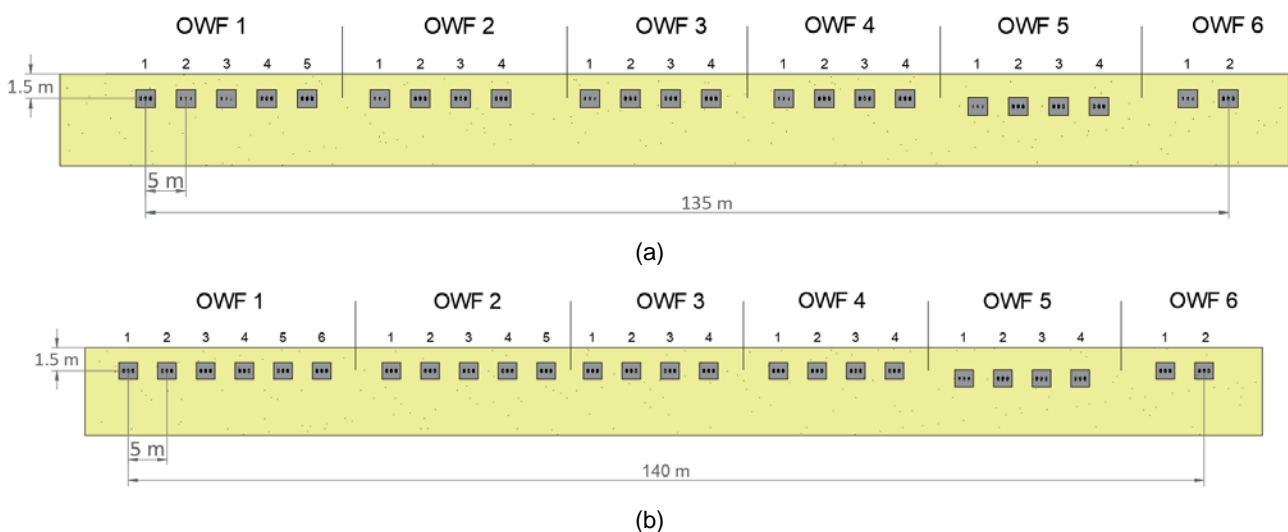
Layout of cable lines adopted for modelling of cable right-of-way - (a) layout with 69 cables, (b) layout with 75 cables
